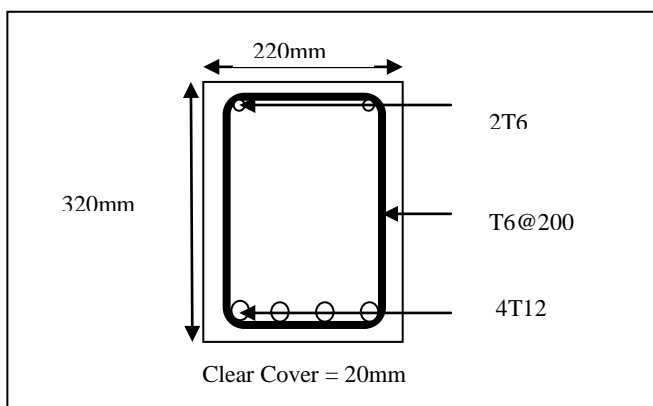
Cross section details of the RC beam (Perera et al (2008))
